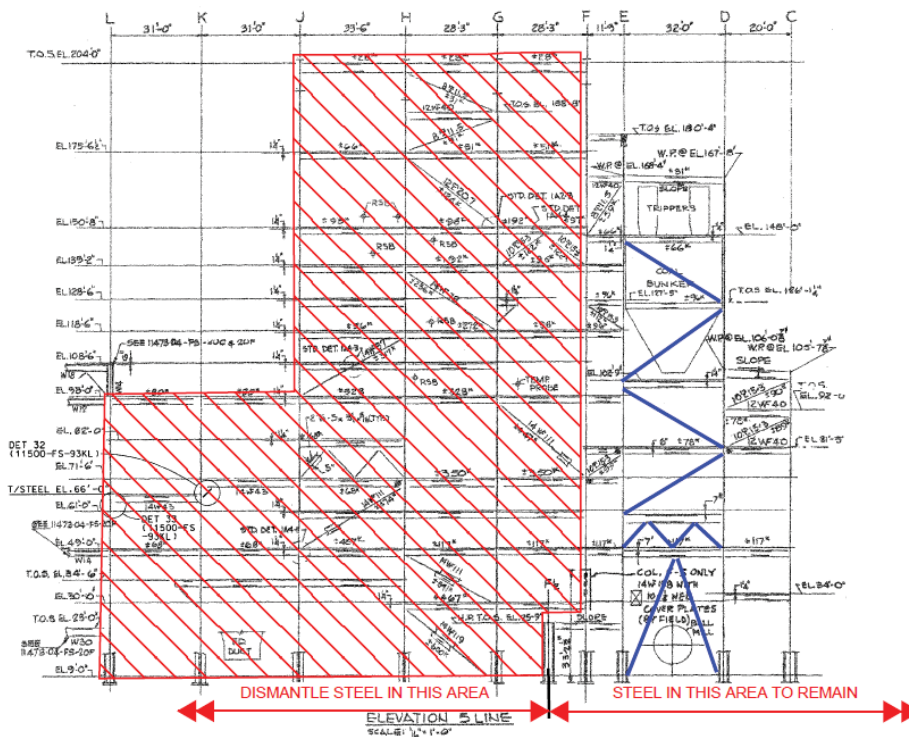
New Vertical Bracing and Boiler Steel Demolition
